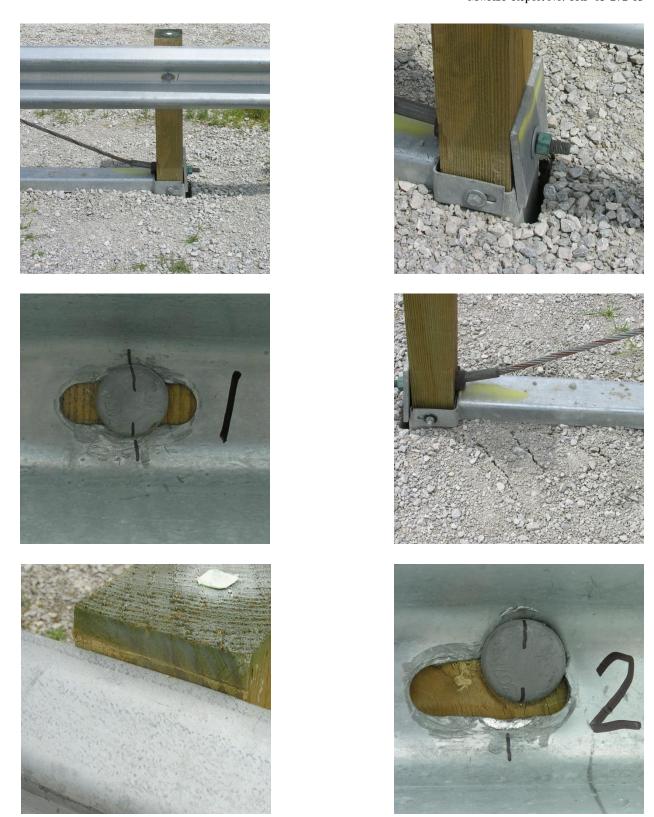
Upstream Anchor Damage, Test No. MGSSYP-1
